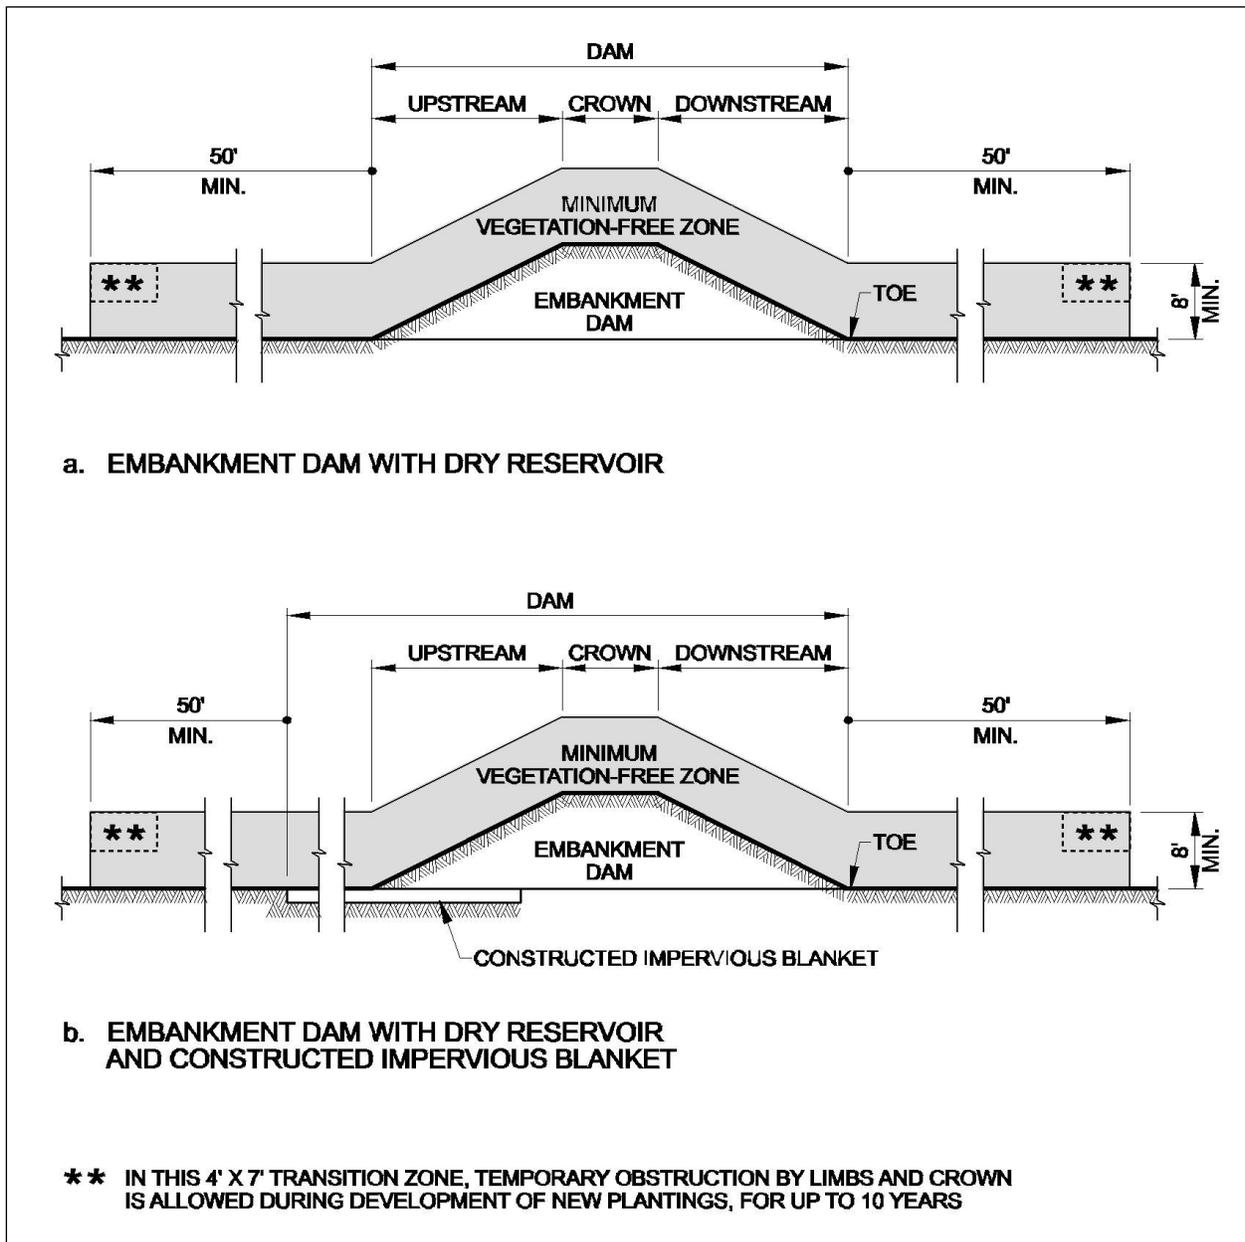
Embankment Dam (Earth Fill, Rock Fill, or Earth and Rock Fill).
